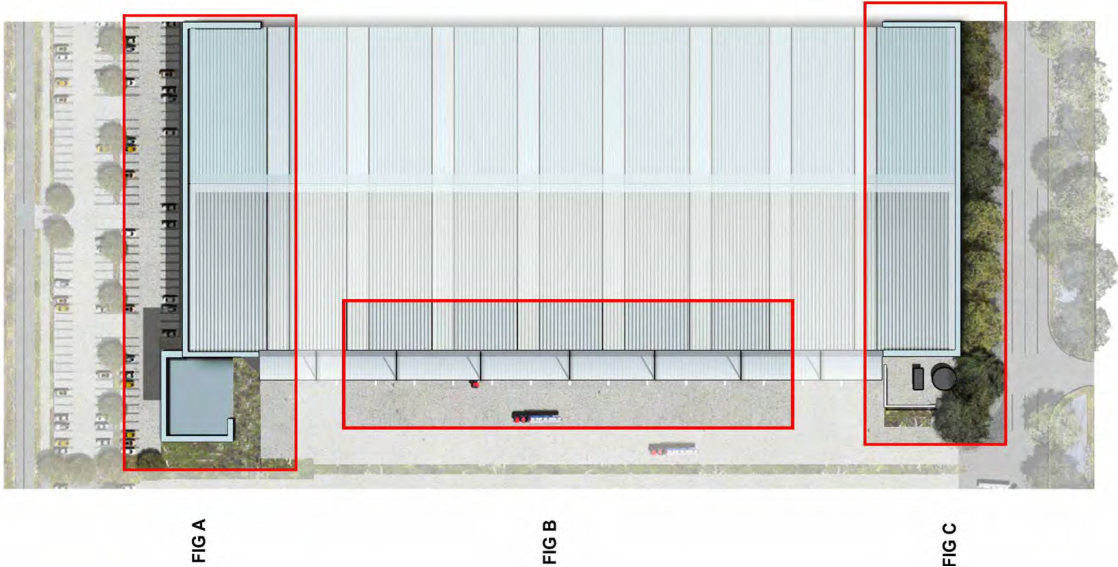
FIG A: INDICATIVE BUILDING FRONTAGE DESIGN
